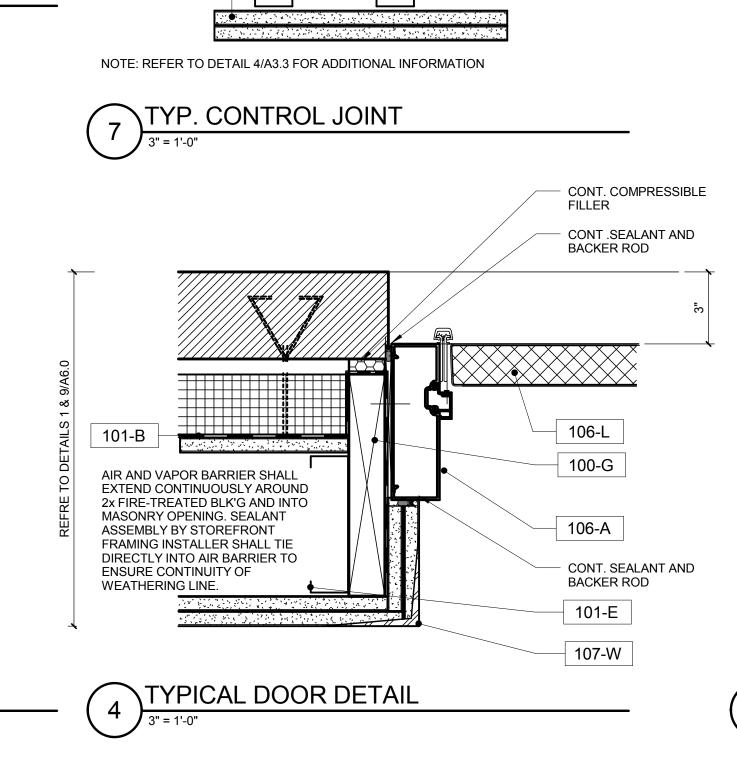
, ENLARGED PLAN KEYNOTES AND TYPICAL CONSTRUCTION, dated 05.19.2015
